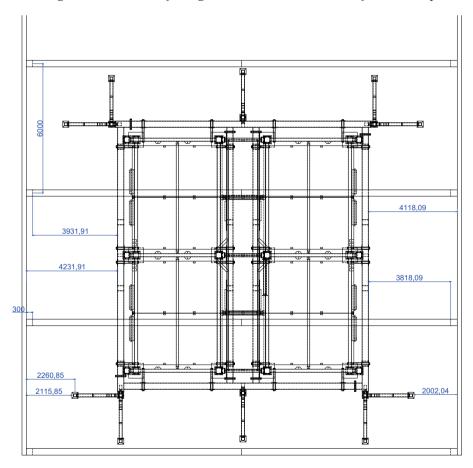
Plan of Sangis' warehouse – constrains for test setup
